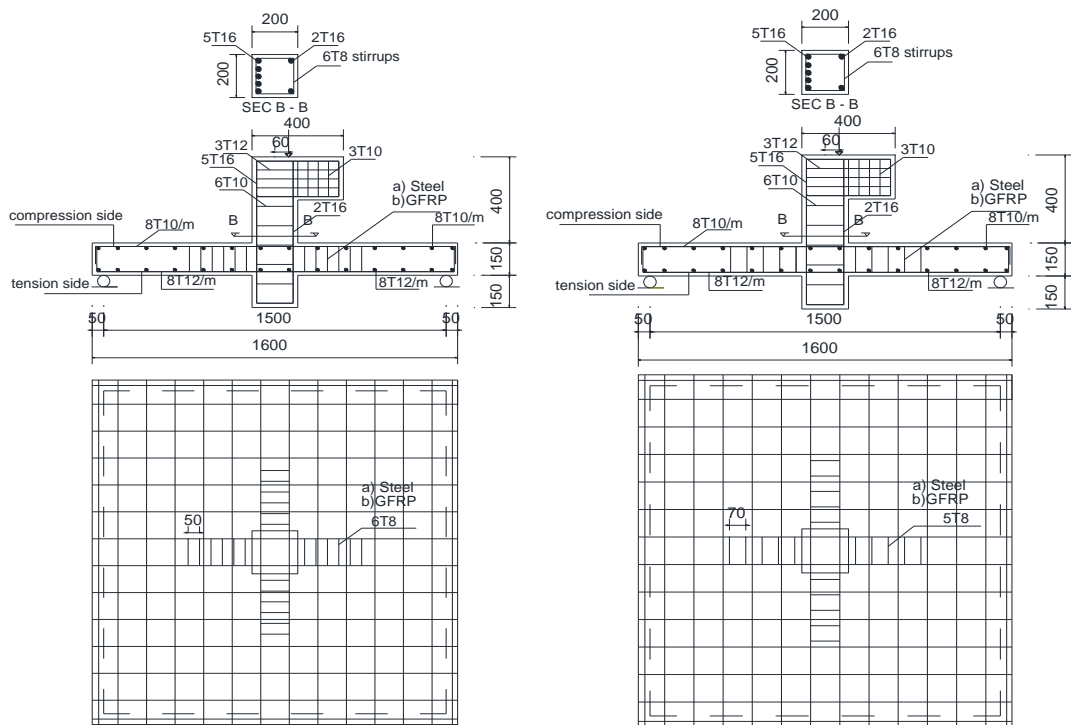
Reinforcing schemes (all dimensions in mm): a) Steel Stirrups, b) GFRPS.
